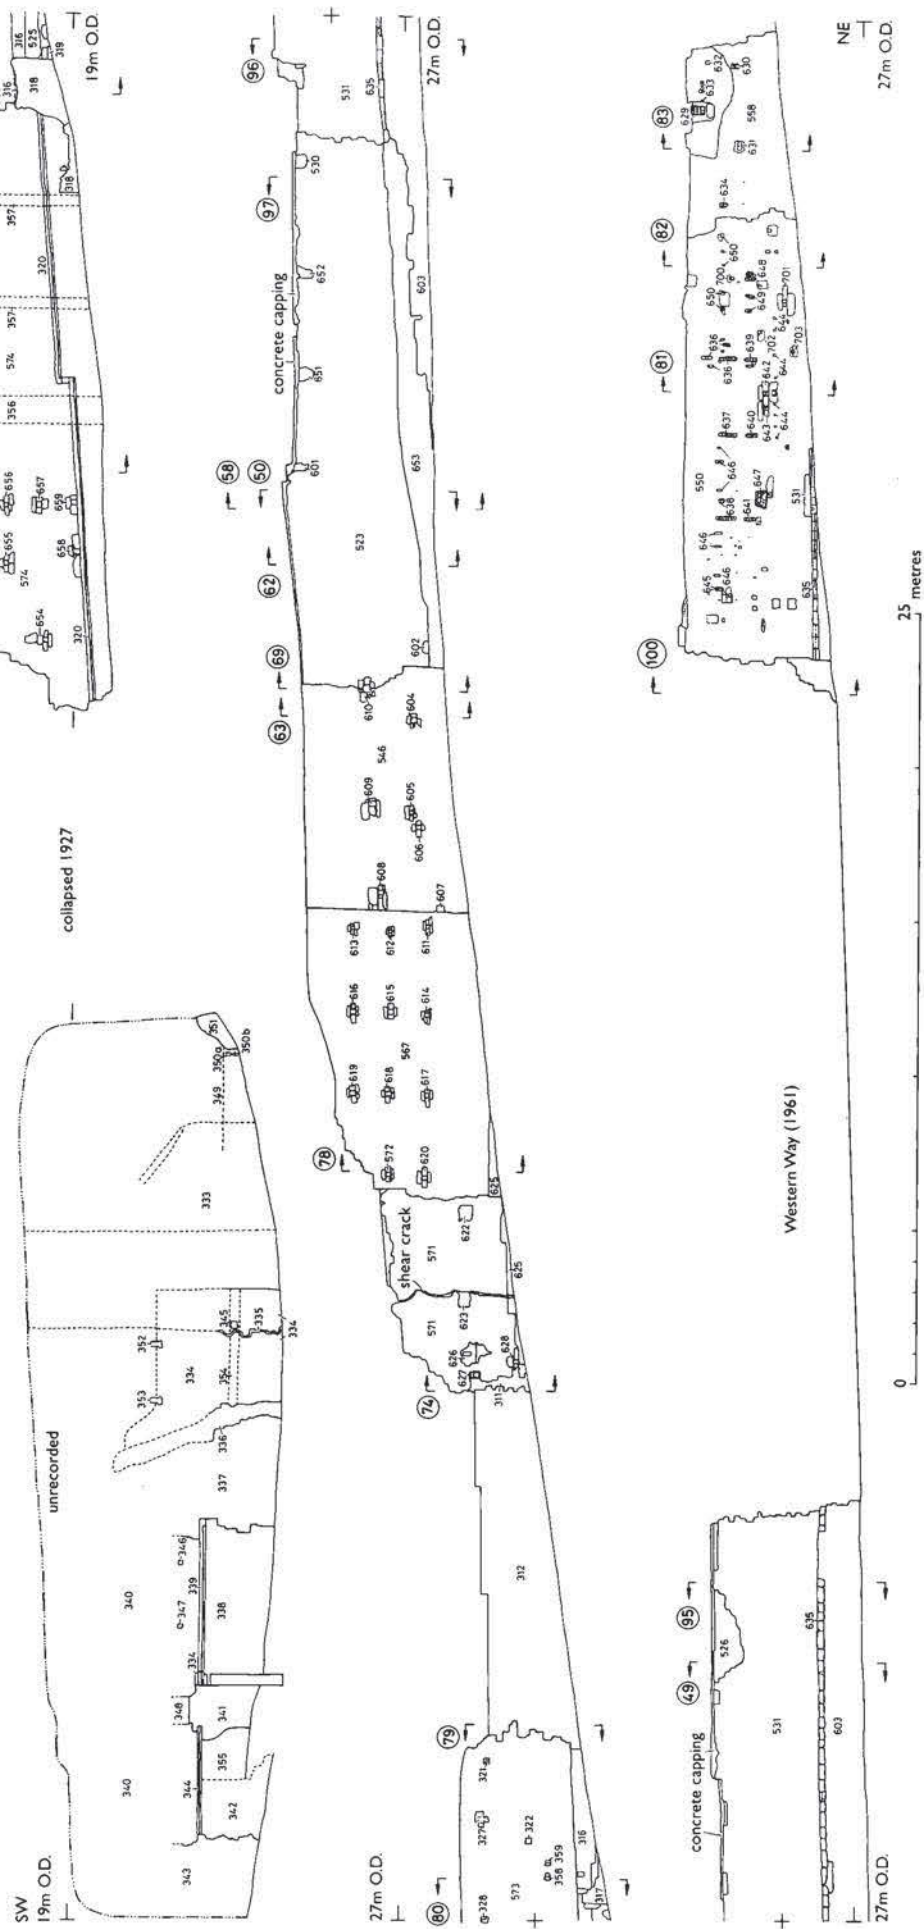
Southgate-Watgate, External elevation. Scale 1:250.
